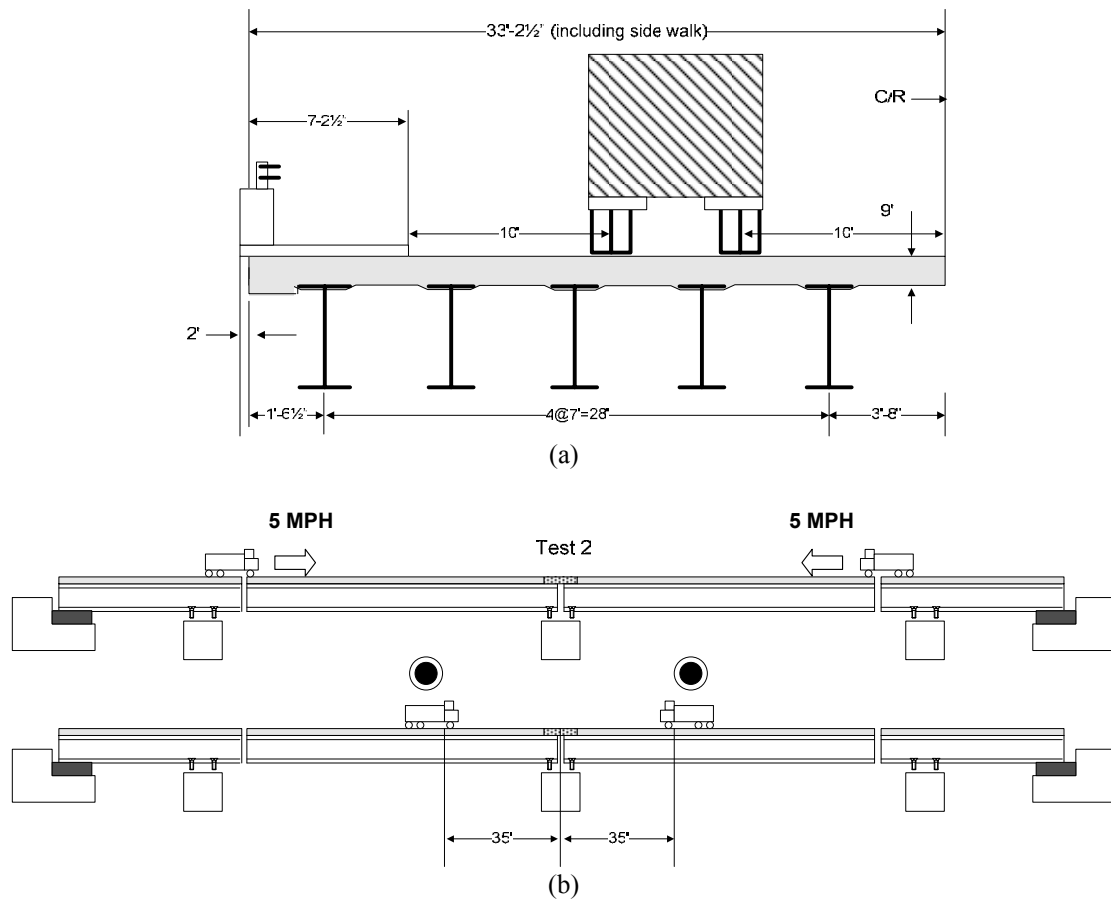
(a) Transverse truck location of Test #2; (b) Load plan for Test #2
